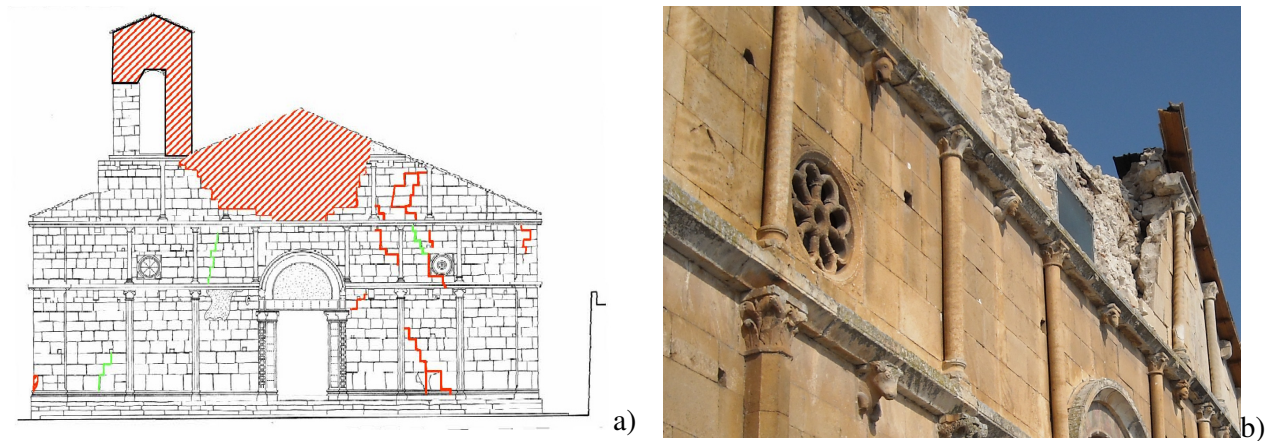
a) Crack pattern of the façade and b) out of plumb of external leaf of the masonry wall.
